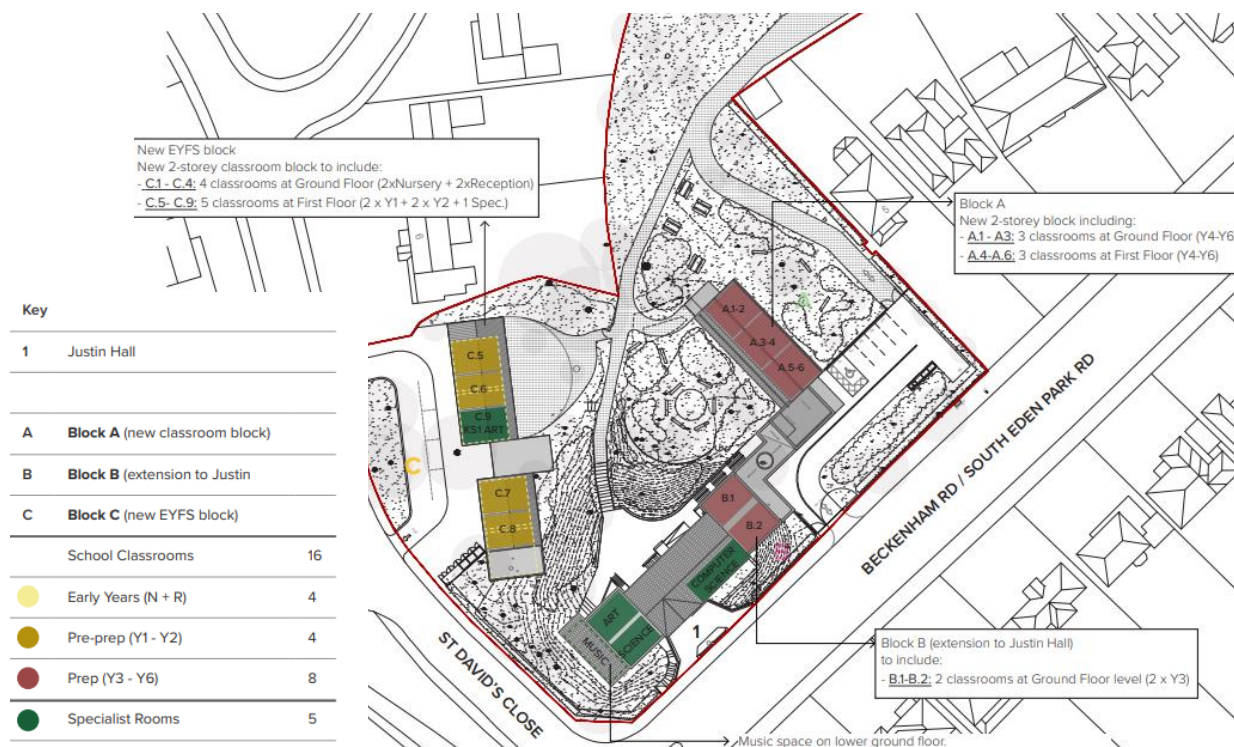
Proposed Masterplan Phase 2 (subject to subsequent planning application)
